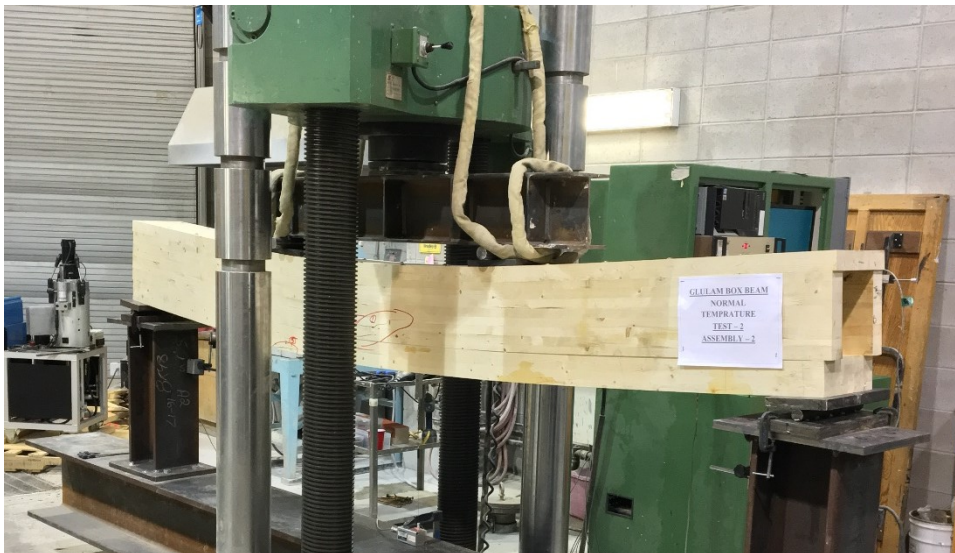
Brittle failure in the bottom flange of a general screwed beam assembly
